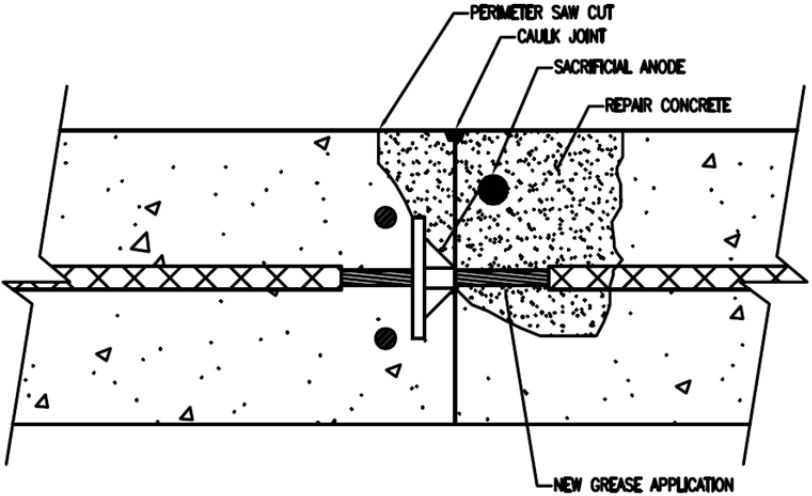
Corrosion protection repair at construction joint without strand / anchorage replacement.
